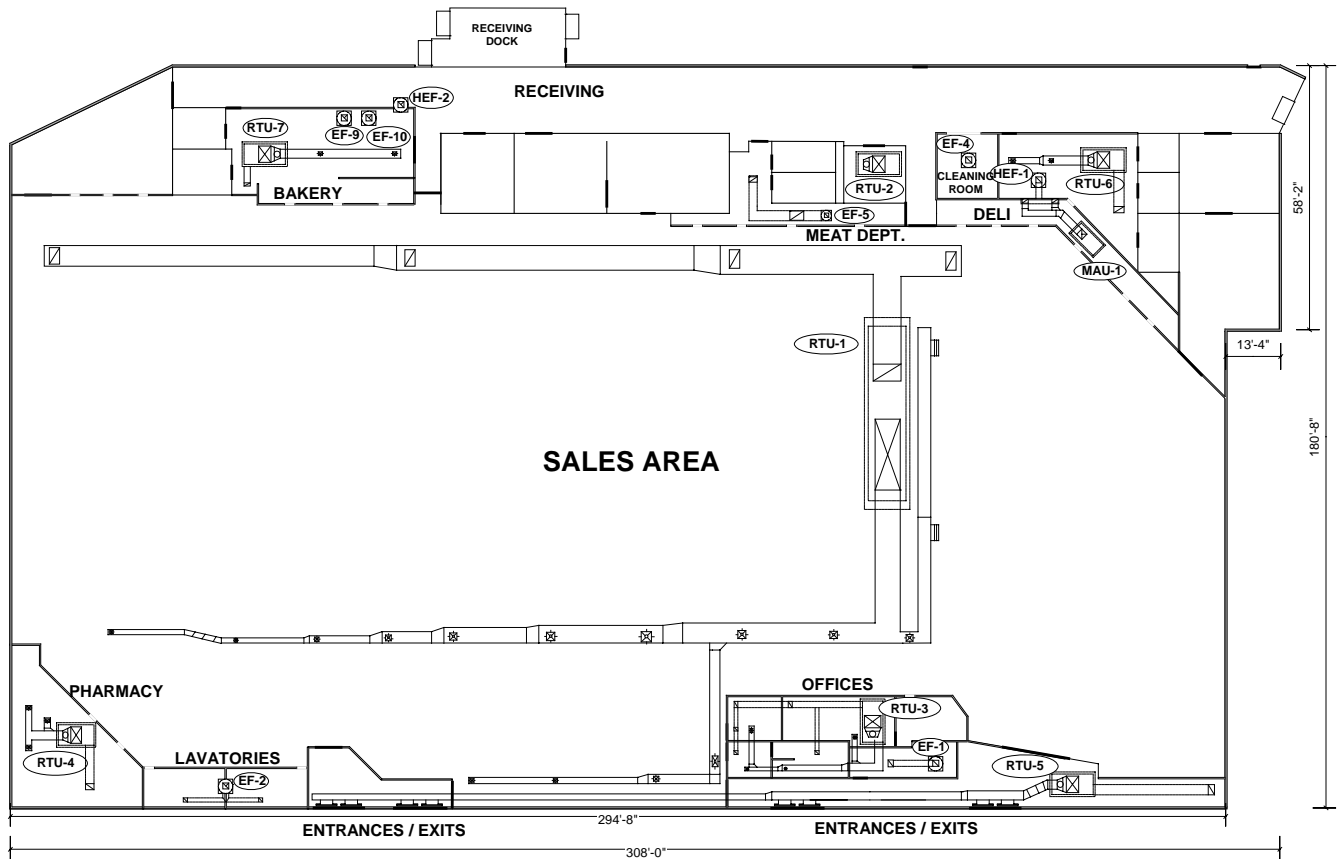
RTU, MAU, and Exhaust Fan Layout with Ductwork
